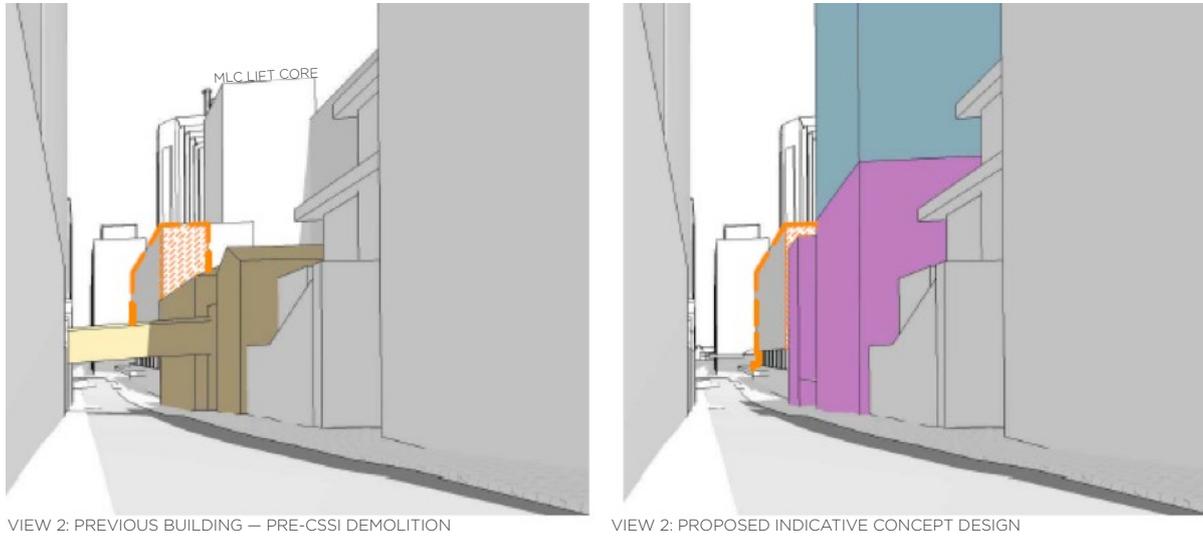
Pre-demolition view (right) and proposed view (left) from the eastern side Denison Street at the junction with Berry Street MLC building shown in orange, pre-demolition building form on subject site shown in brown, CSSI Approval shown in pink and OSD building envelope shown in blue.
